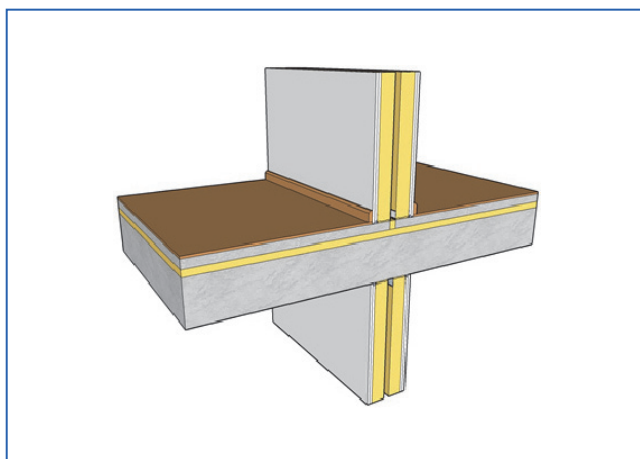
Lightweight wall structure and concrete floating floor on monolithic concrete slab.
